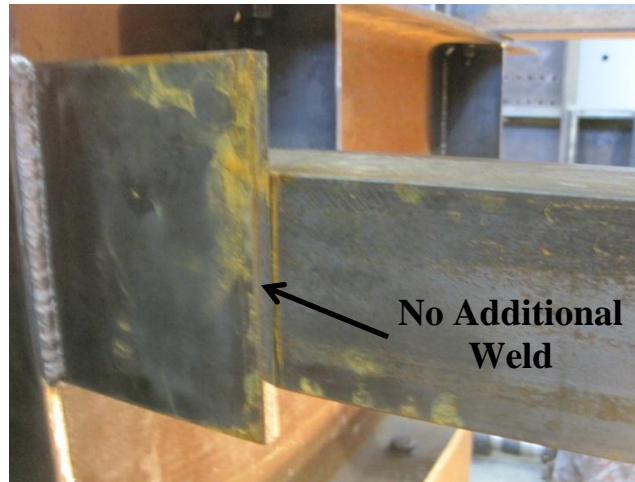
Absence of Additional Transverse Weld on Reverse Side of Angle
